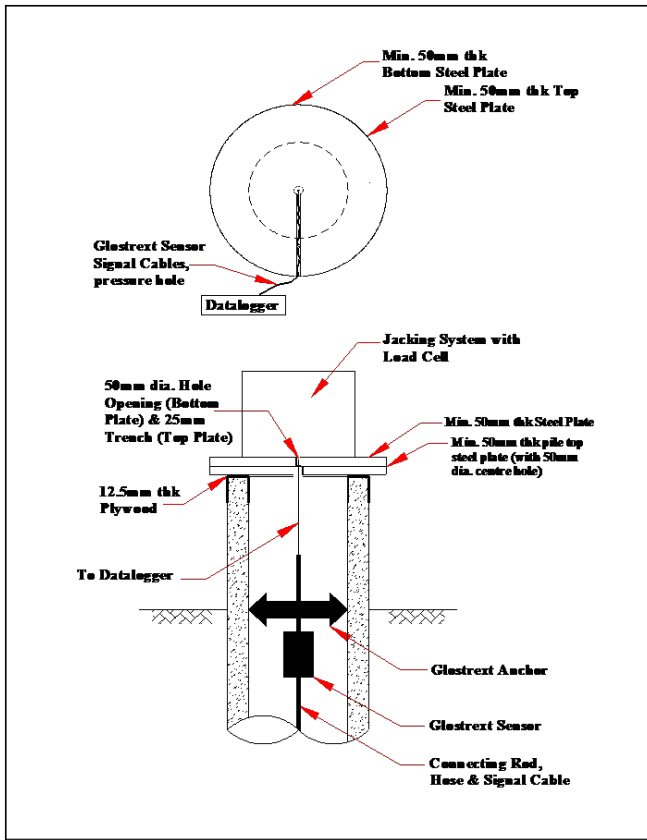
(a) Arrangement of retrievable instrumentation approach for typical spun pile instrumentation application.
